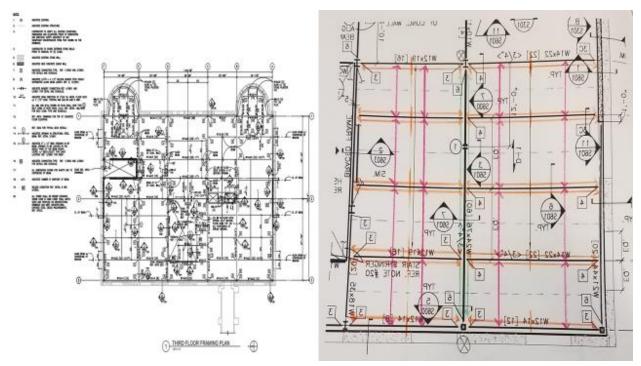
Homework problem asking students to use the floor framing plan structural drawings on the left to determine and trace the load path on an enlarged printout of a portion of the same floor plan.
